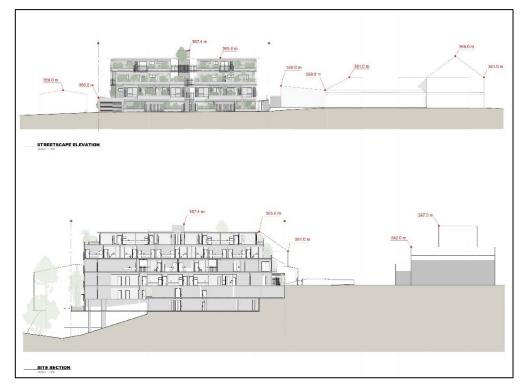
Streetscape Elevation (Source: TP13 from Plans of Development)
